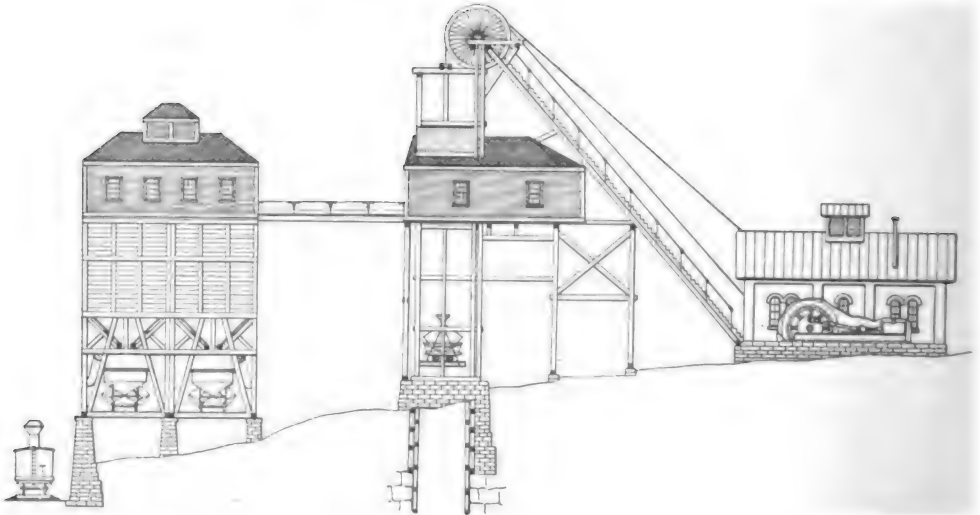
HEAD HOUSE AND BINS, LEISENRING NO. 3 COKE PLANT.
